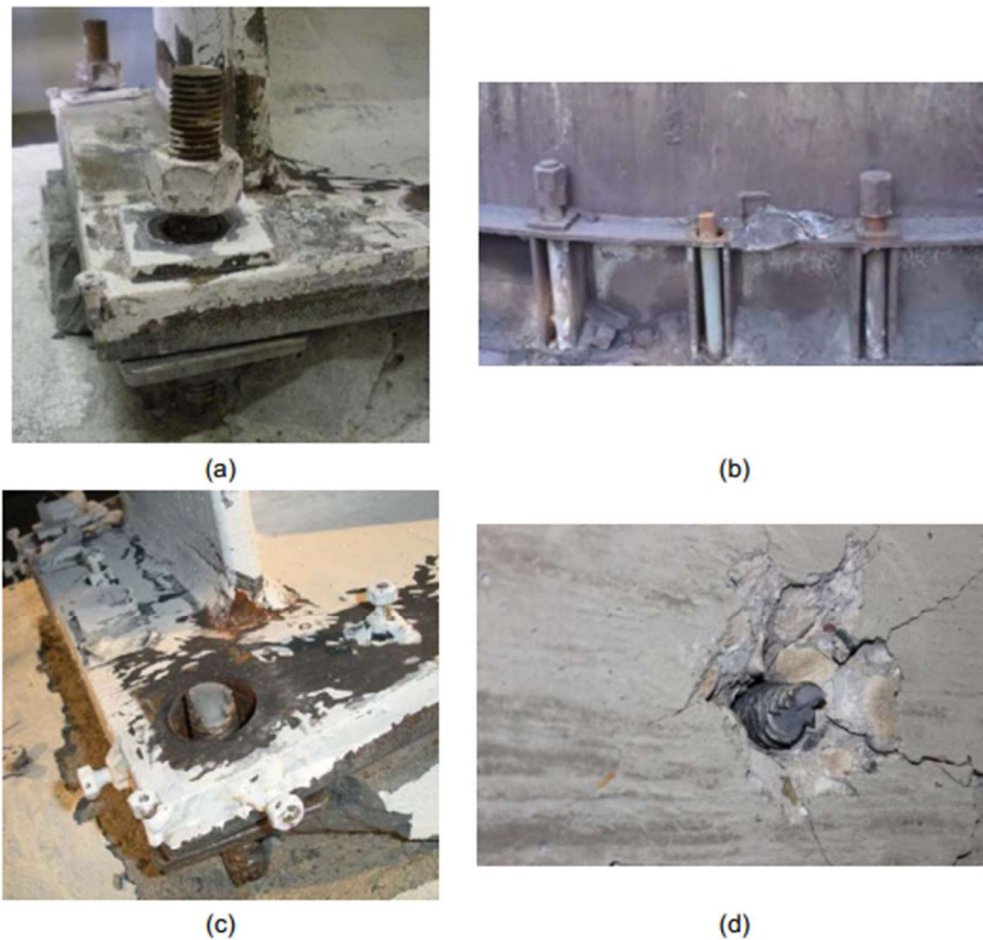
Anchor bolts failure in tension: (a) Yielding, (b) and (c) Yielding and fracture (d) Close-up of the fractured surface on the anchor shaft (Gomez et al.,2010)
